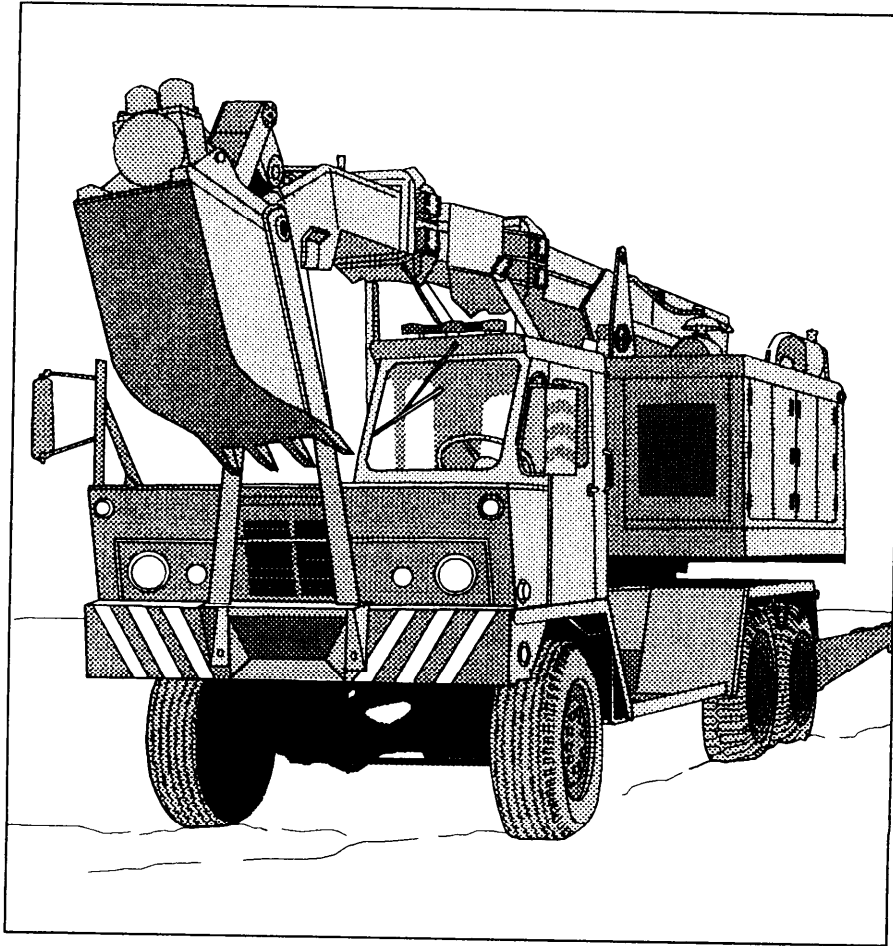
Truck carrier-mounted multipurpose excavator.
